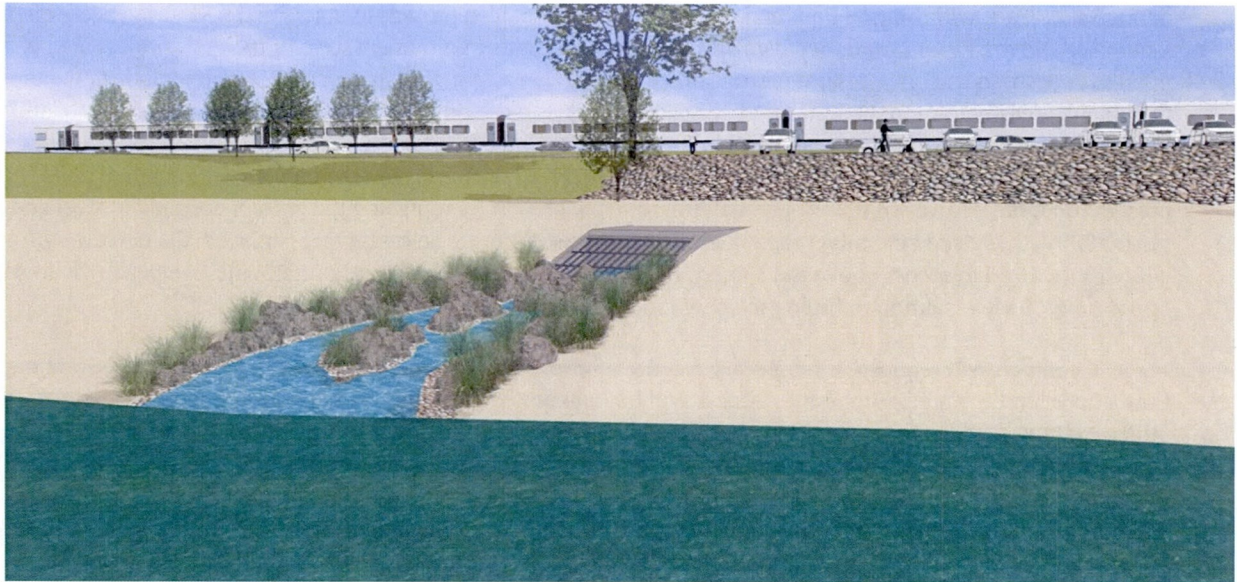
Ground plan view rendering of the UT-3 outfall and natural stream based on 10% engineering design.
